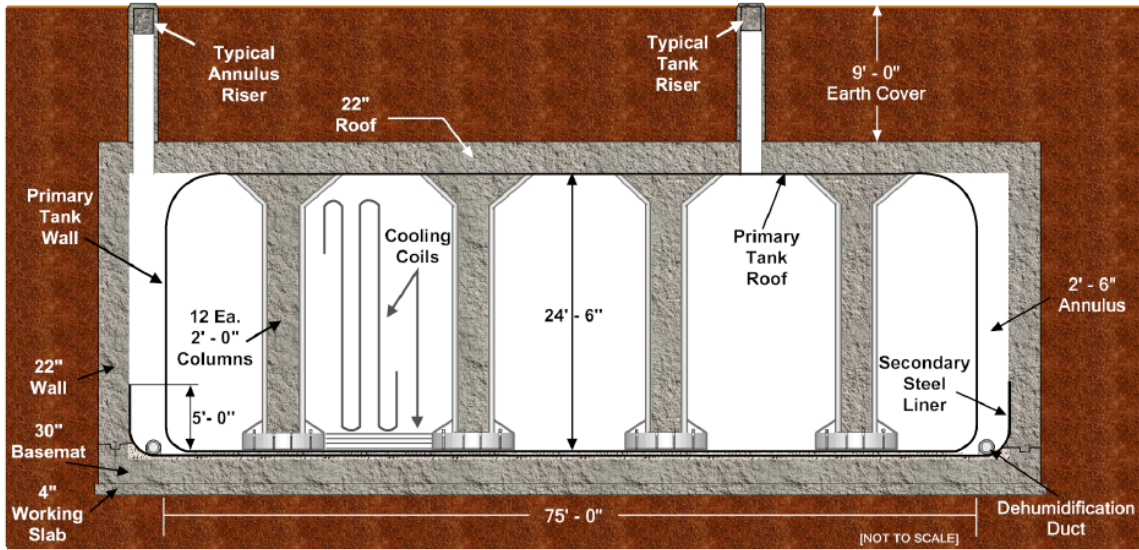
Type I tank cross-sectional view (SRR, 2010b)
